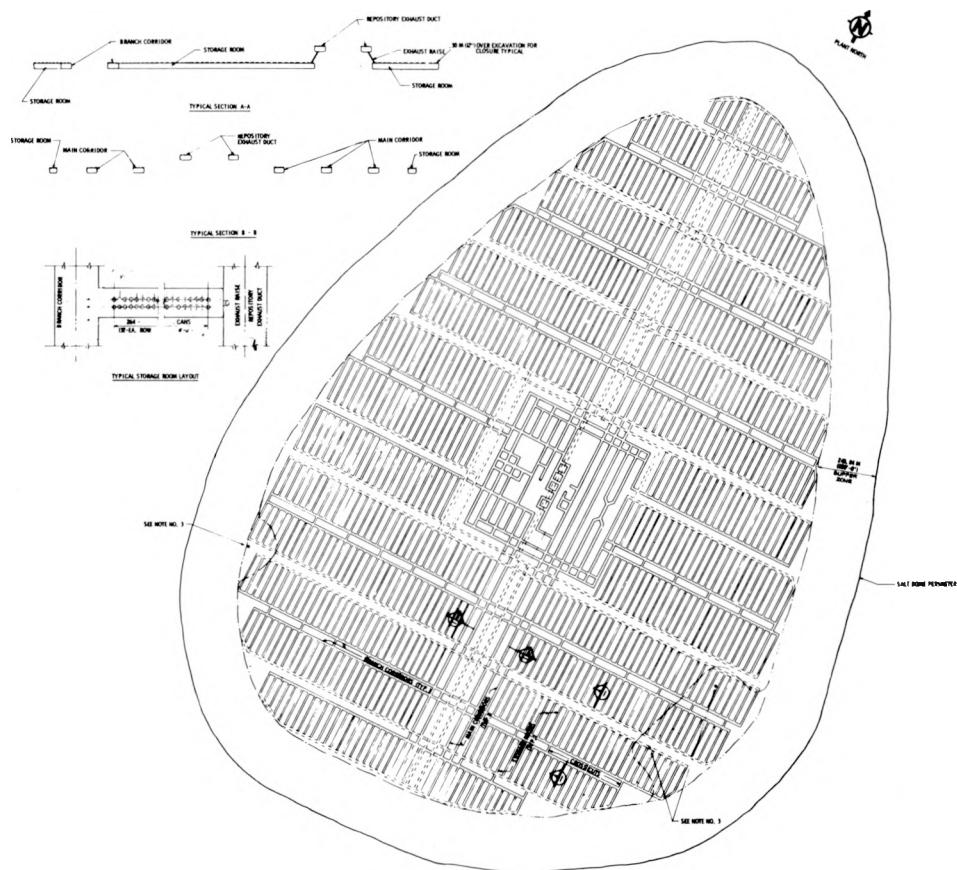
NWTS-CRRD UNDERGROUND LAYOUT
